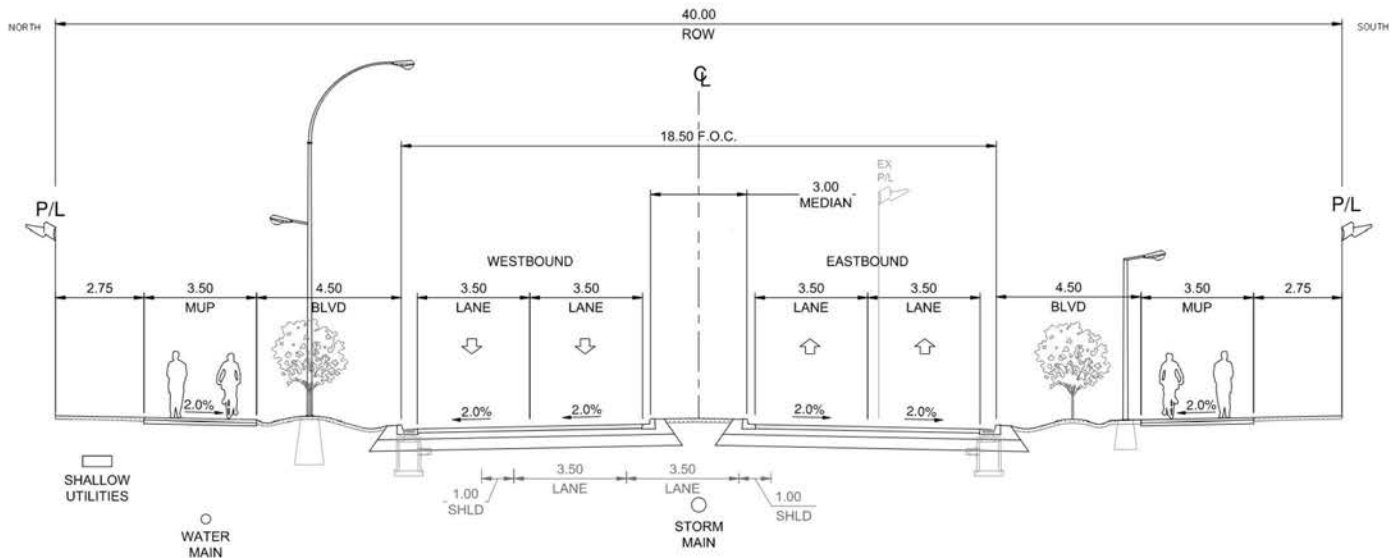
Typical Cross Section of Proposed Memorial Trail
